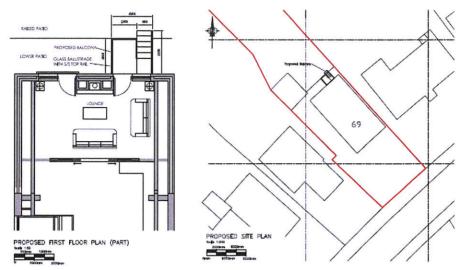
extract from approved drawing No: TS9185/01 Rev A, received on 6<sup>th</sup> September 2022 pursuant to planning application 10/22/0885 – proposed floor plan and site plan
